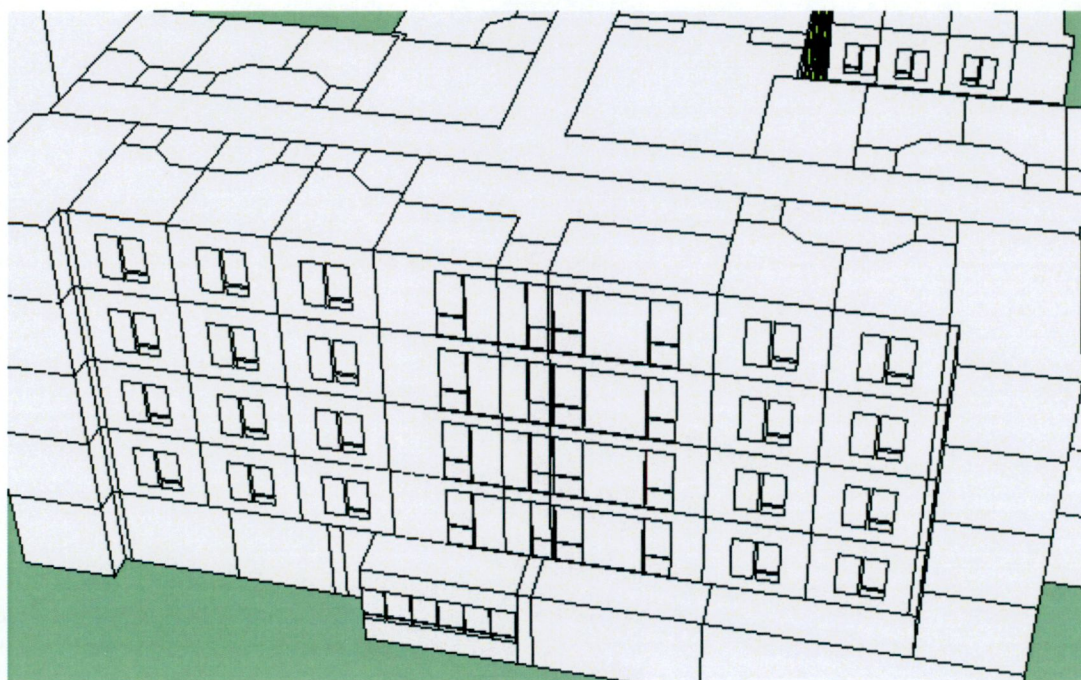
Sun Exposure on North Elevation March 21<sup>st</sup>
